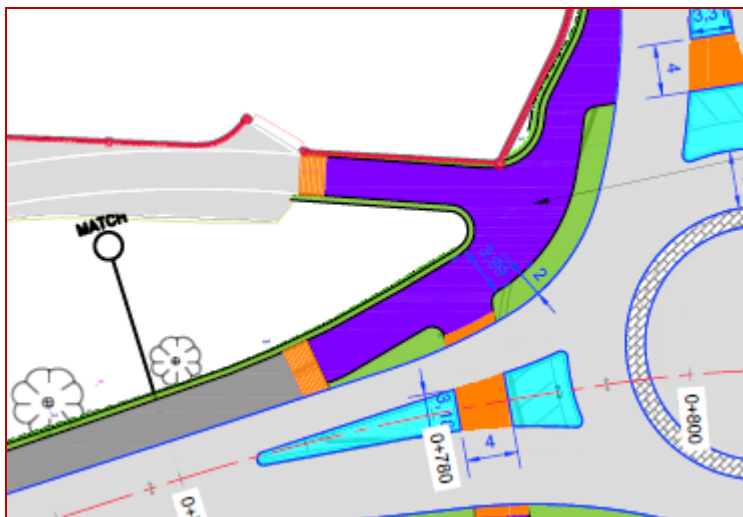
Shared Area Link to Footpath at Kilkenny Cross Roundabout
